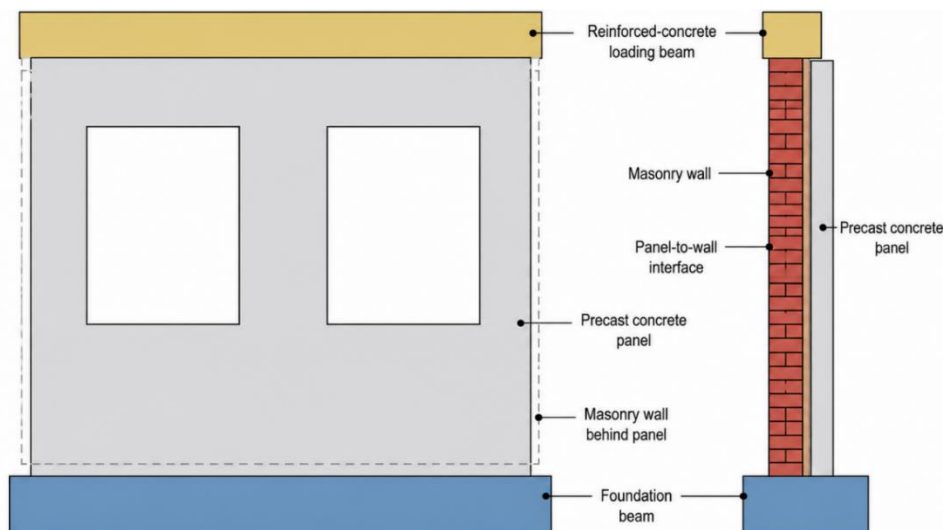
Common wall geometry and precast-panel arrangement of strengthened specimens SW1–SW3
